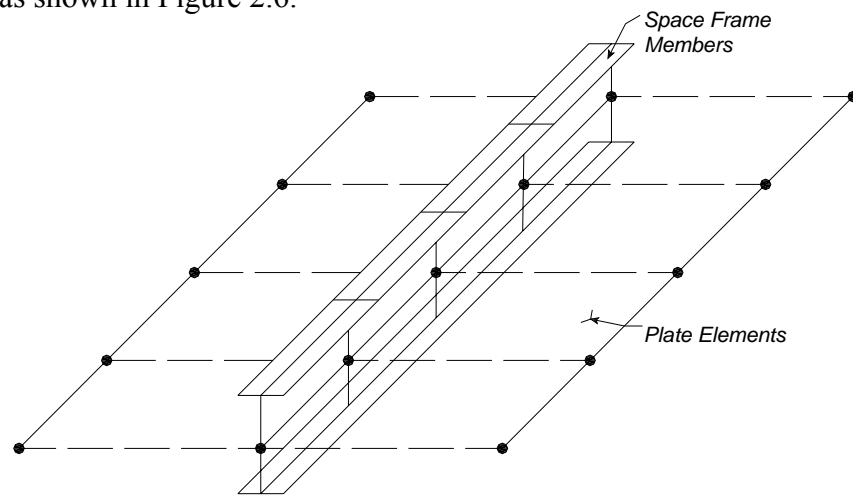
Typical Concrete Deck and Girder Element (Case 1).(Hays et al. 1986)
